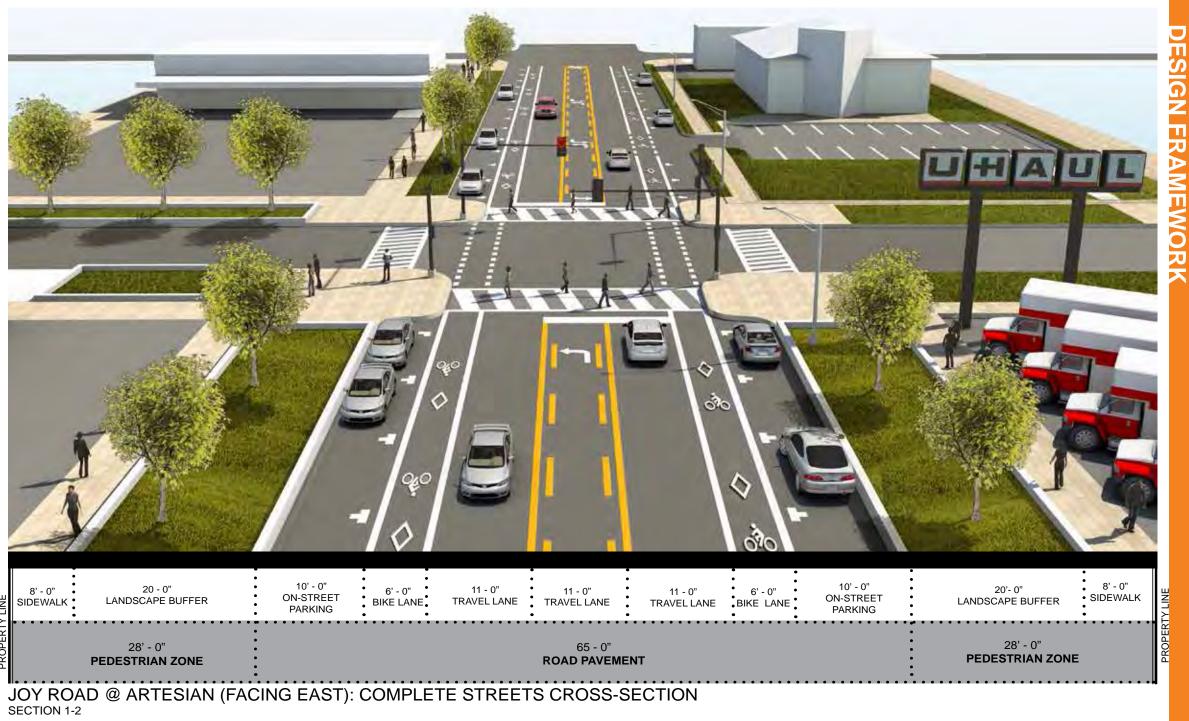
Joy Road and Artesian Road Intersection (Facing East)
